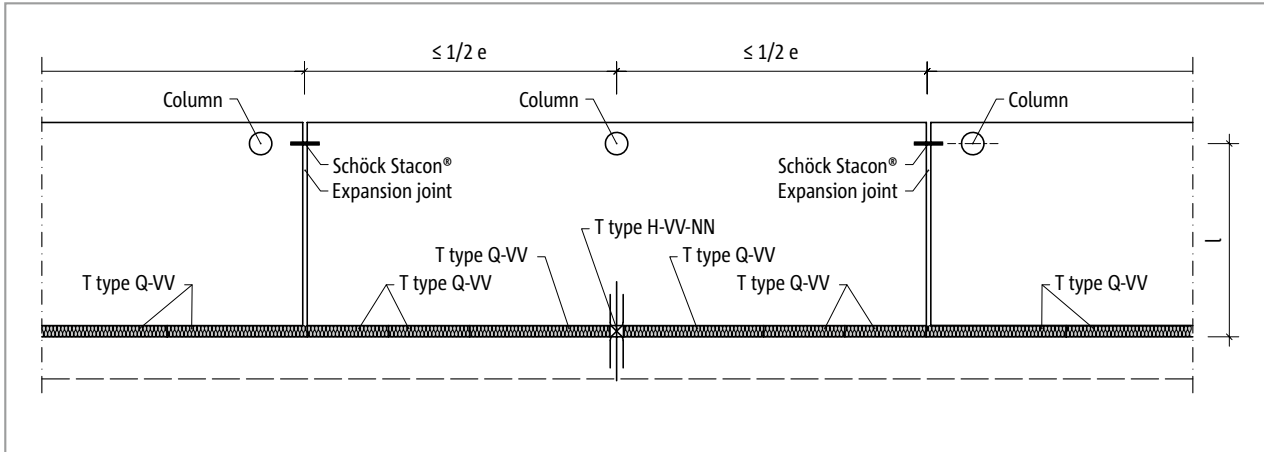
Schöck Isokorb® T type H: Expansion joint layout
